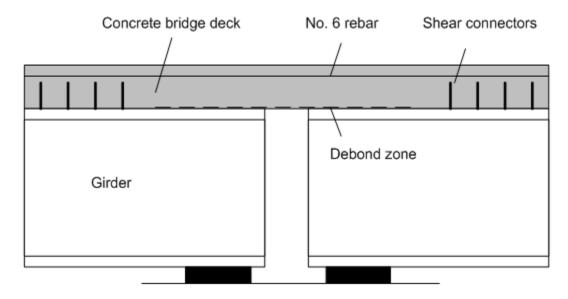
Typical link slab detail recommended by Caner and Zia (1998)
